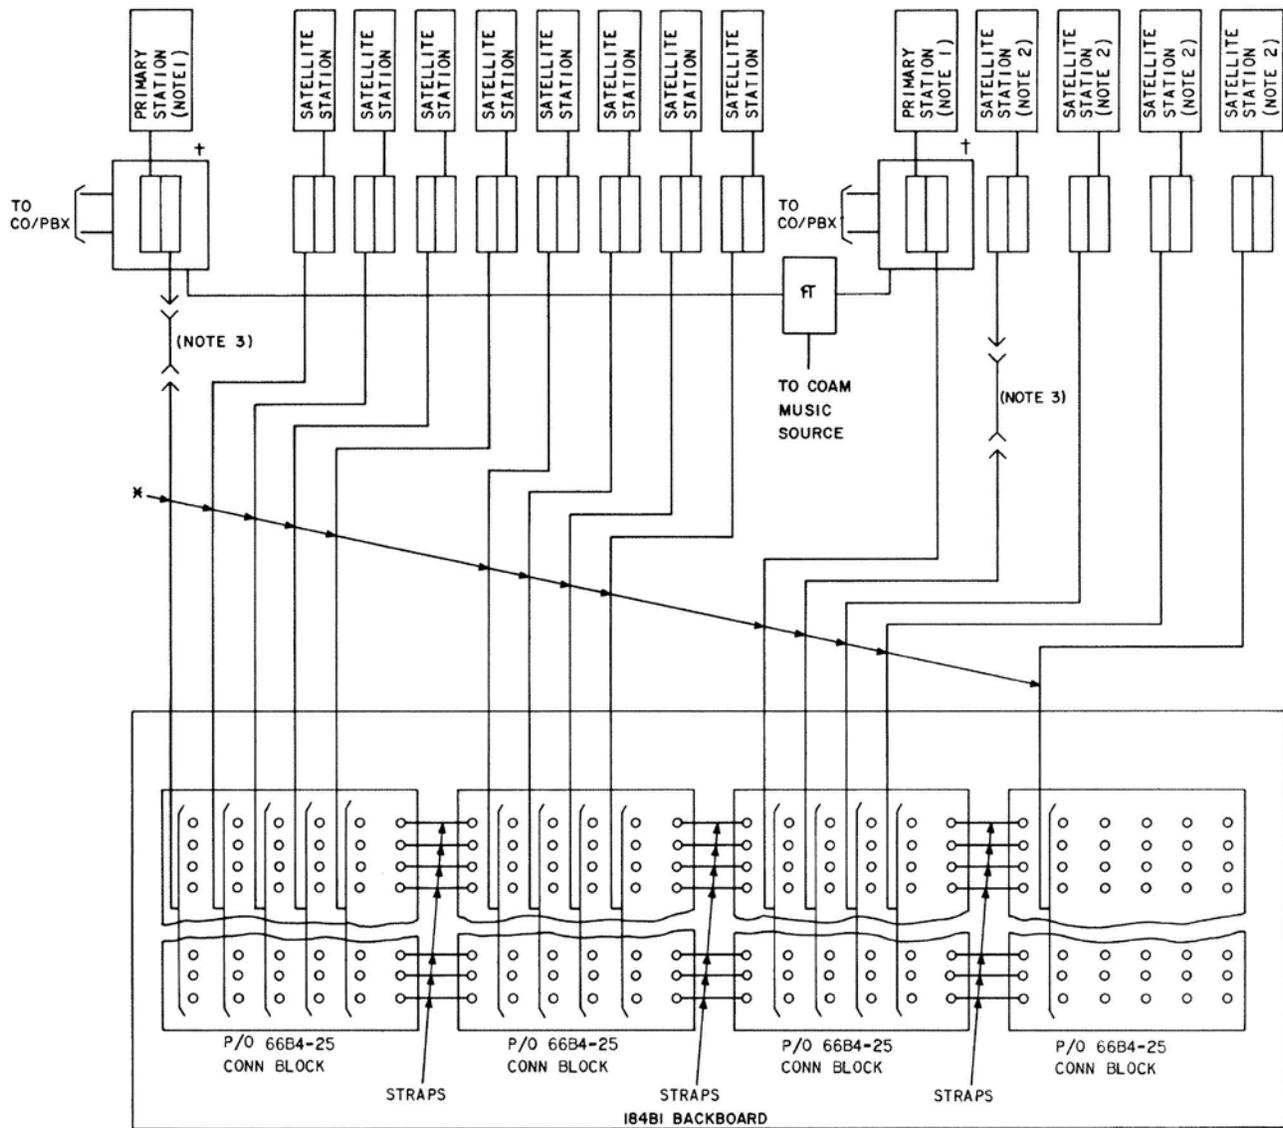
Typical Installation, Using Bridging Adapters and Connecting Blocks
